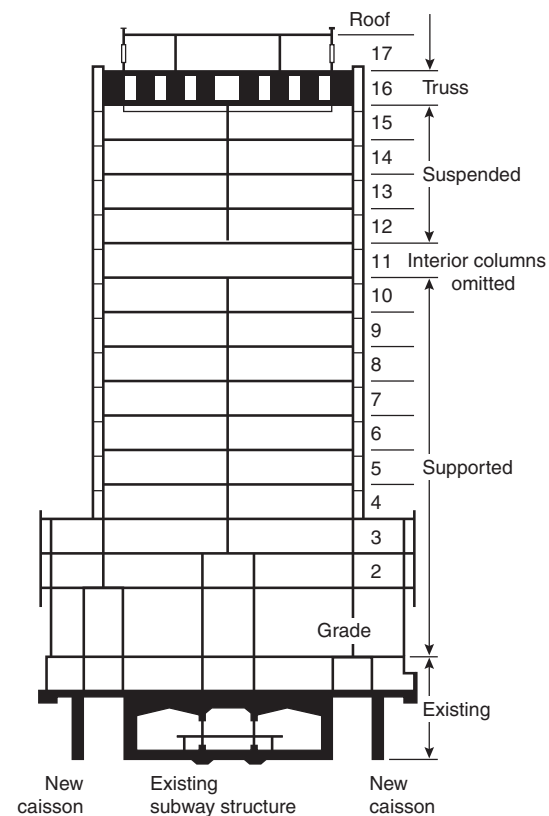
Vierendell truss providing support from above and below.<sup>33</sup>
